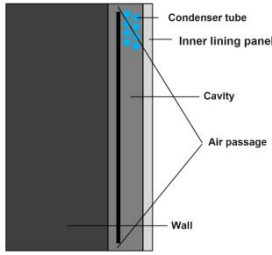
Prefabricated building exterior wall structure based on water-water-cooling system
